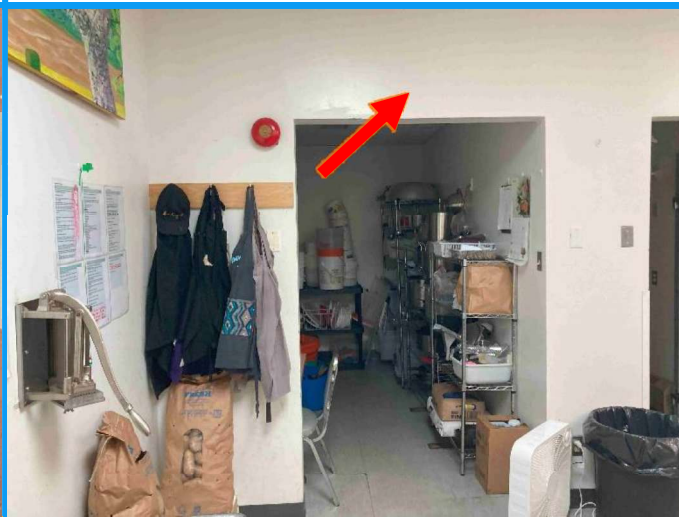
View of light grey paint on non-asbestos drywall walls and bulkheads (see arrow) in the kitchen of the café section of the subject building, which was determined to contain a lead concentration exceeding the 0.009% limit as outlined in the federal surface coating regulation.
